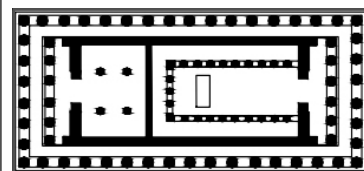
Typical Greek peripteral temple plan.<sup>13</sup>
